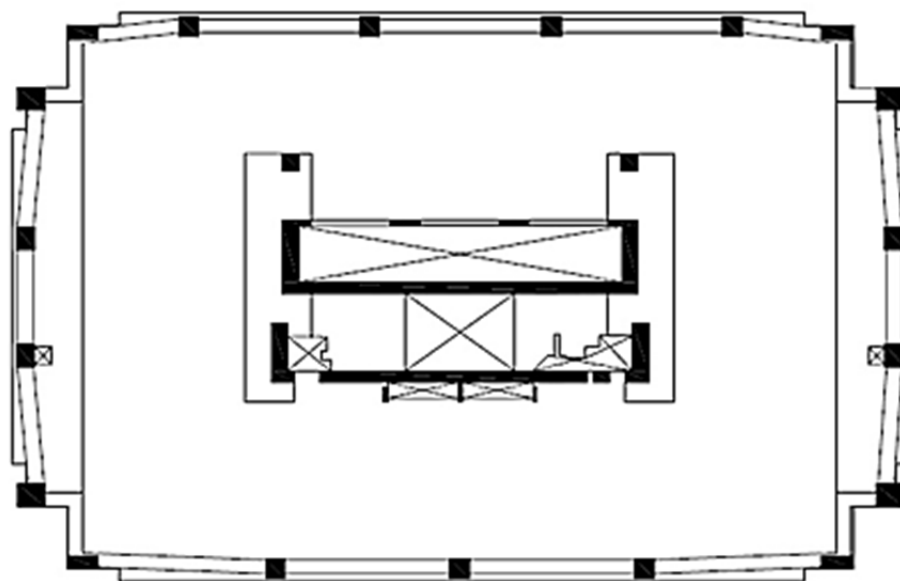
Typical floor plan of high-rise office building in Chile (courtesy of Rene Lagos).
